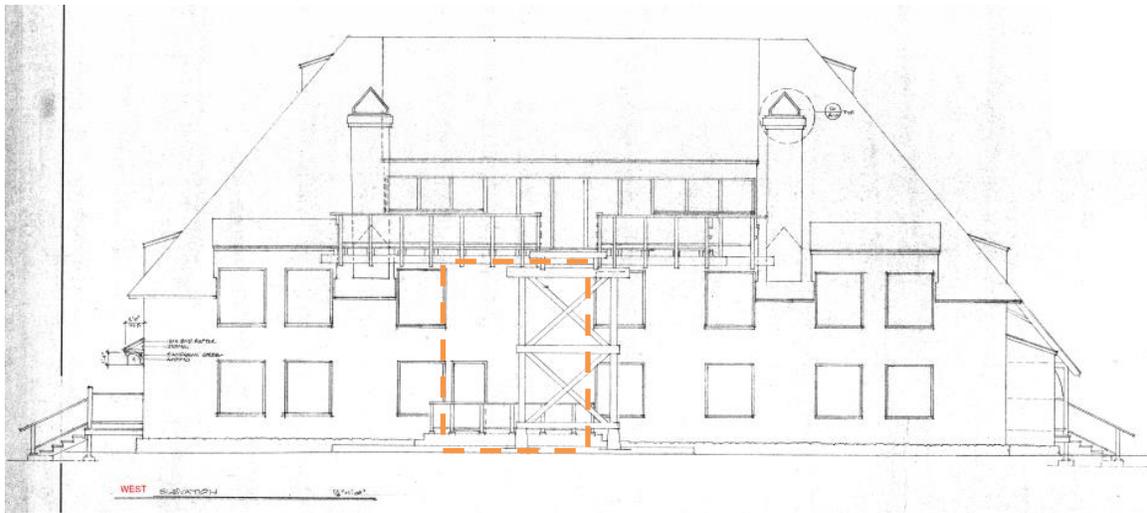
Plan west elevation of Cedar Hall from the 1995 plans. Note by this time, the two-story porch/balcony had been removed, and three of the four door openings infilled (dashed outline). Source: A-1, Cedar Building Remodel, Richard Nicolay Pierron, October 11, 1995, edited by Page & Turnbull .
